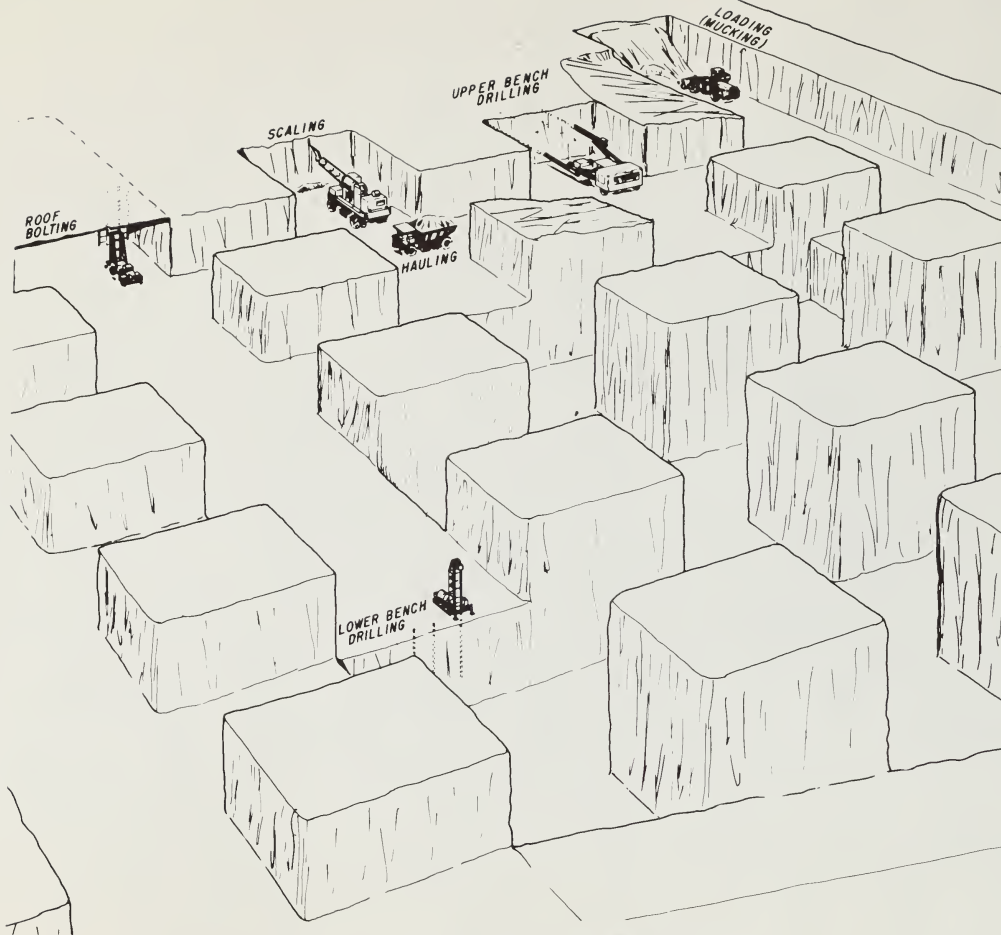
ROOM-AND-PILLAR MINING CONCEPT
